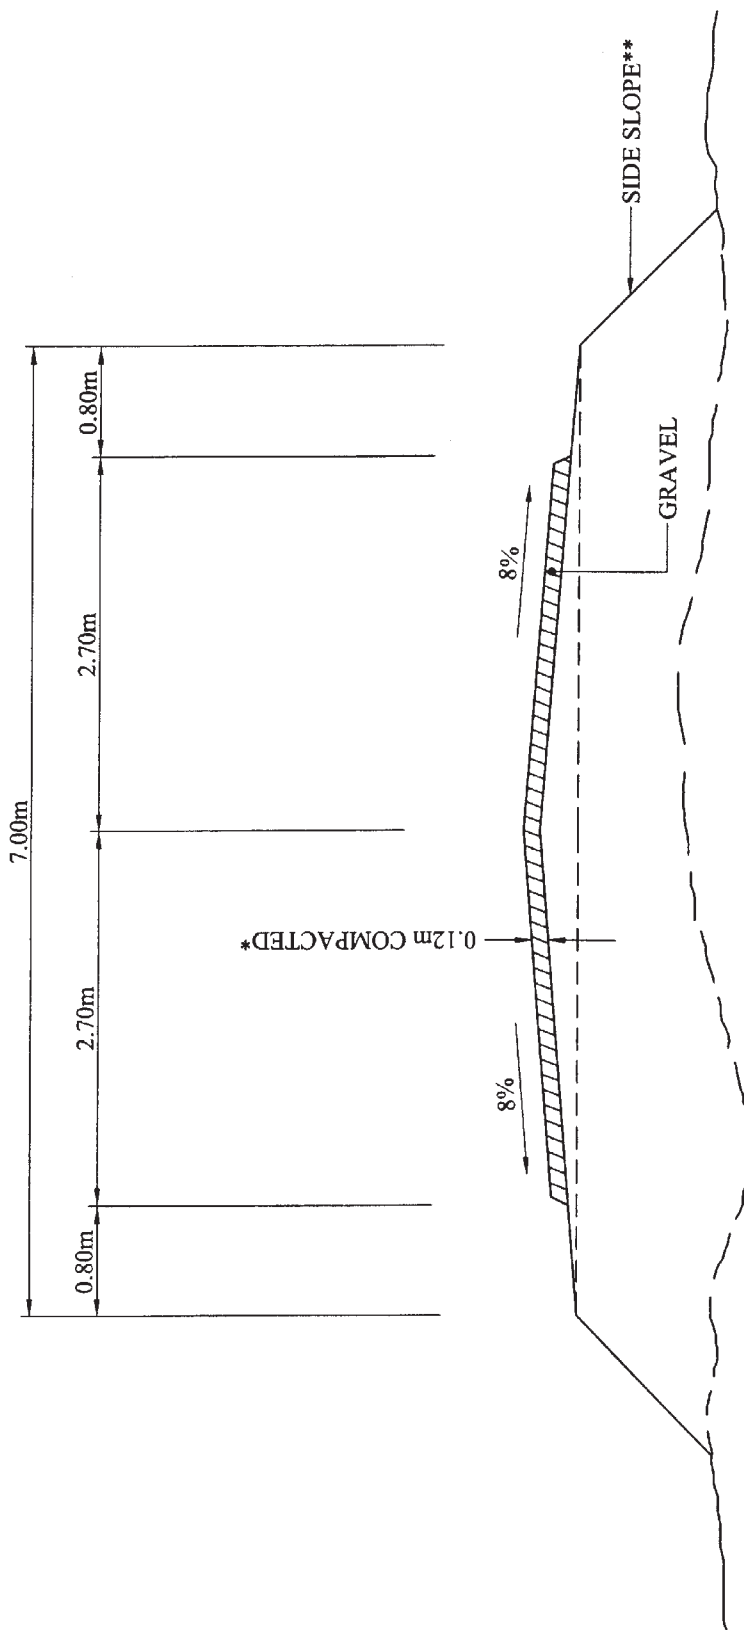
B3: DISTRICT CLASS II ROAD - CROSS SECTION 2C FOR EMBANKMENT
